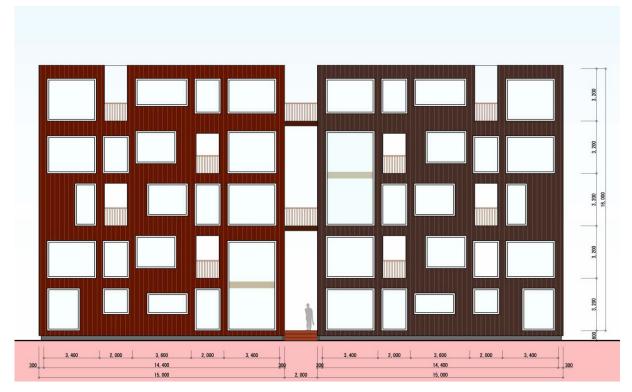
e – Elevation; Dimensions in [mm]
